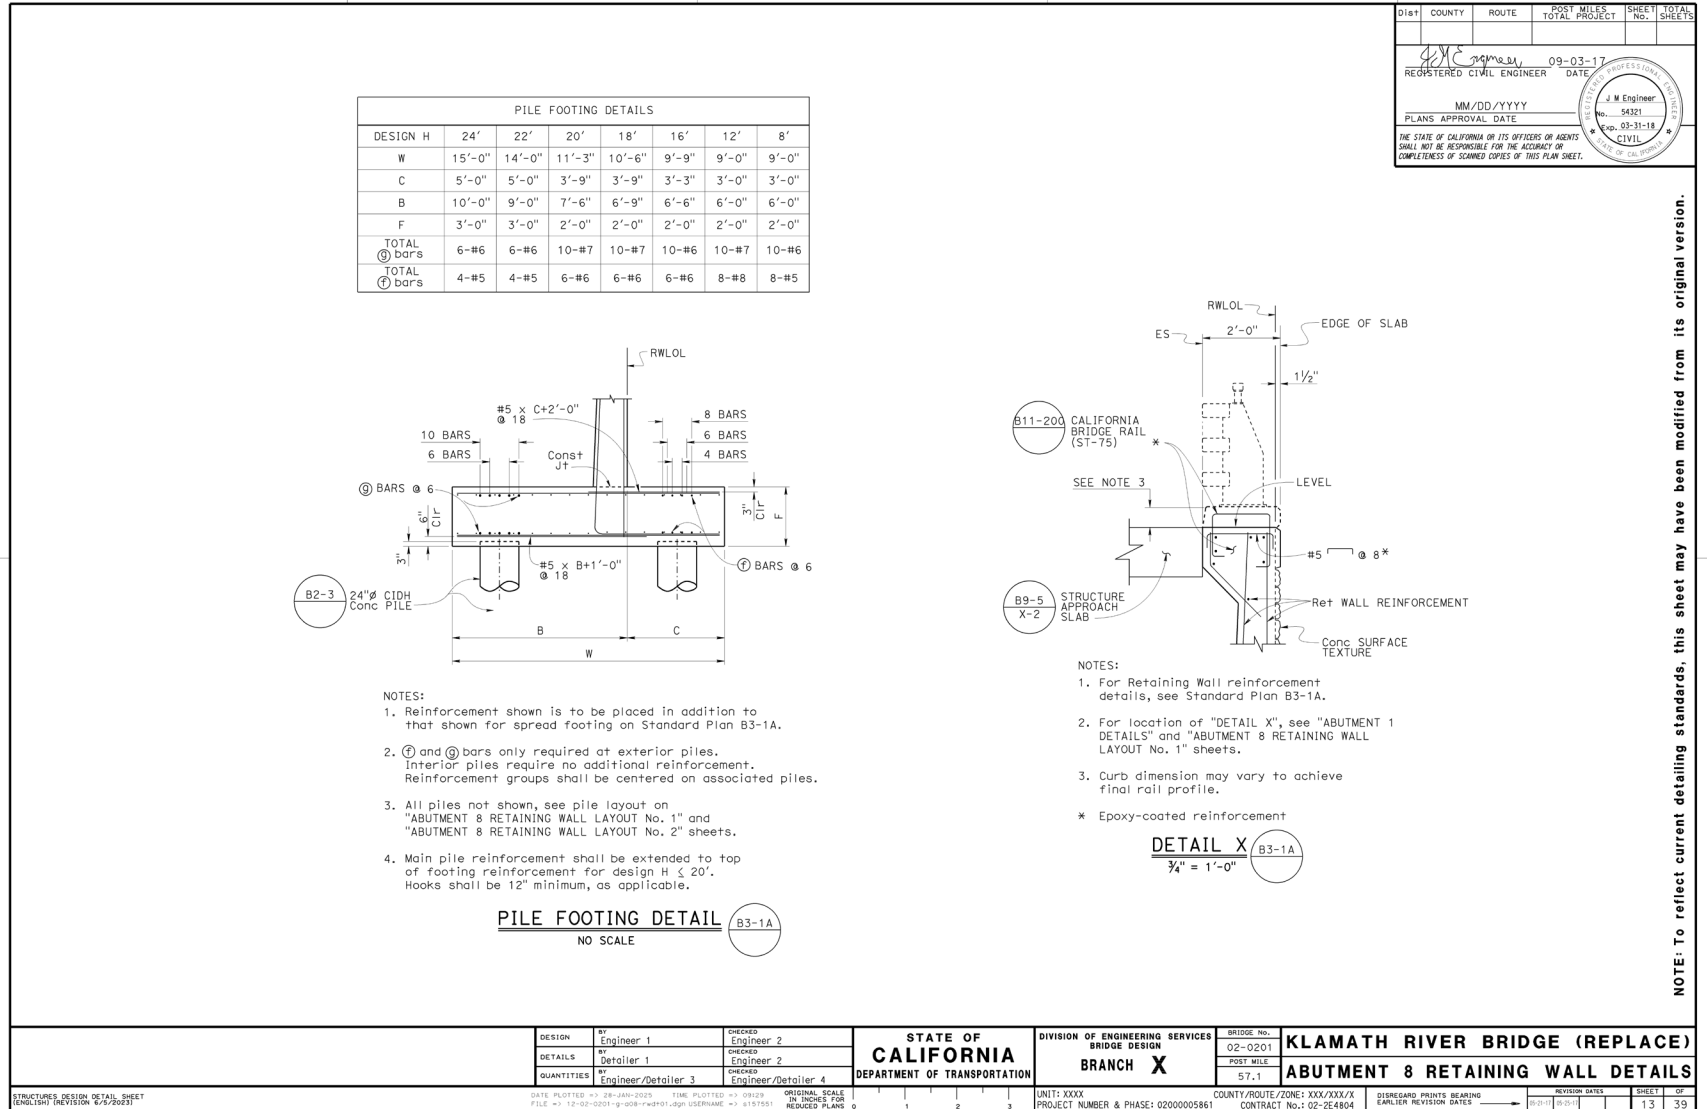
A.A.12 Abutment Retaining Wall Details Detailing Example 12
